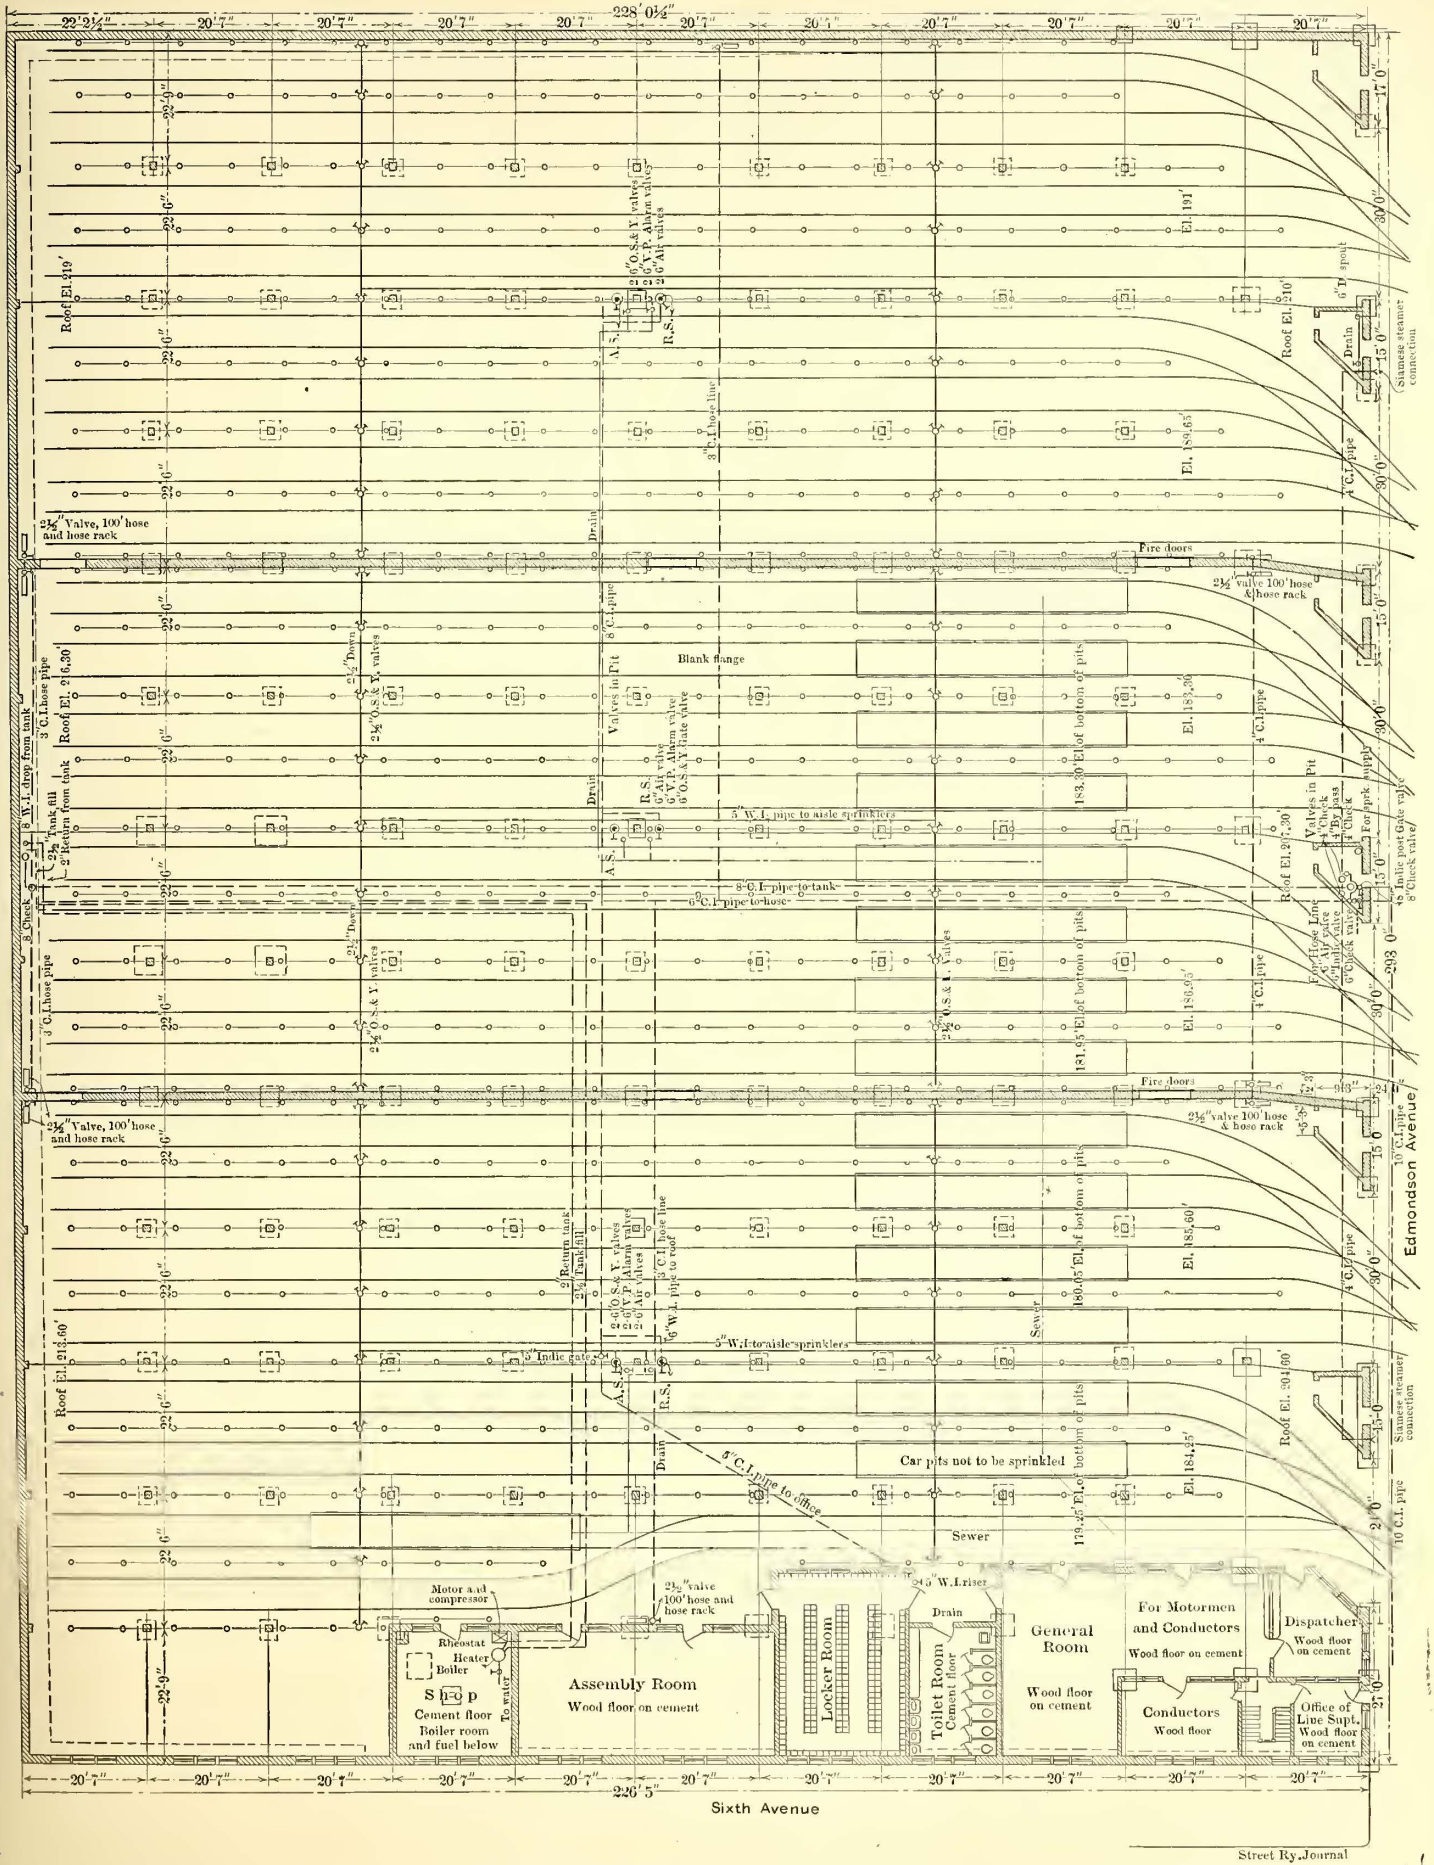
GENERAL PLAN OF EDMONDSON AVENUE CAR HOUSE, SHOWING AISLE SPRINKLERS
